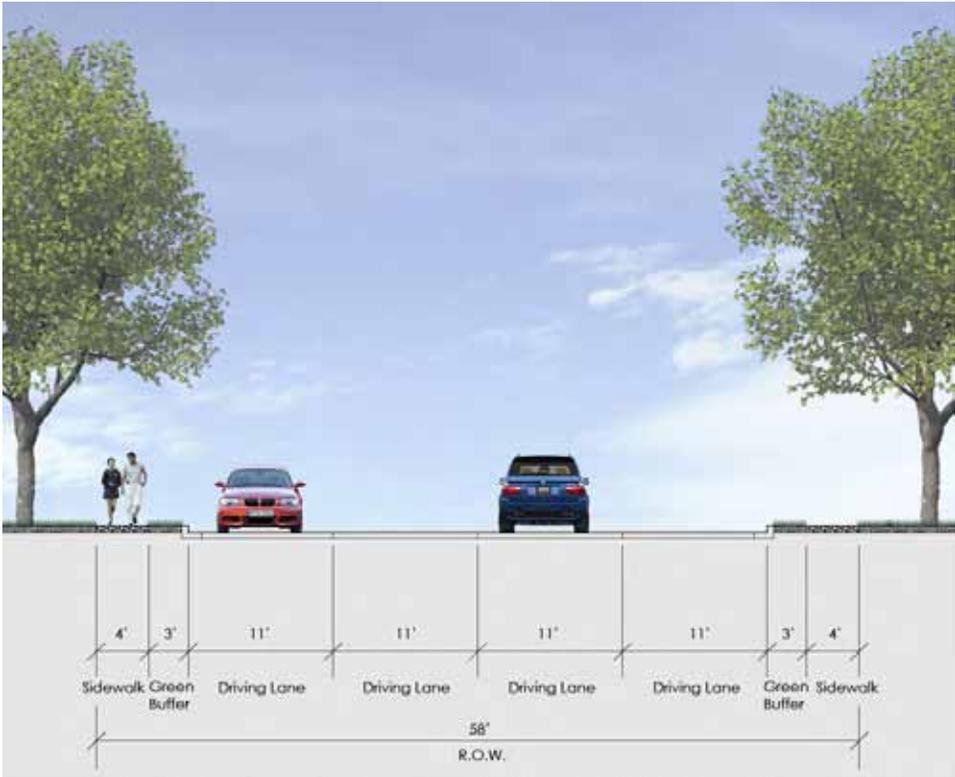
Existing Street Section - Typical 4 Lane, Undivided Arterial Road - Arlington
